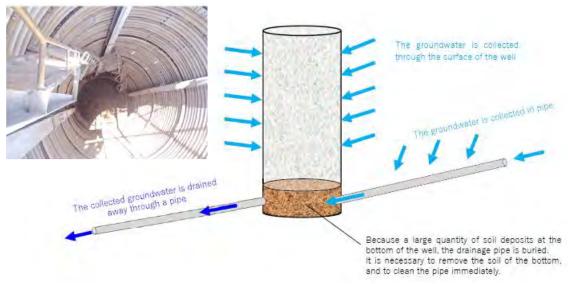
Existing drainage well in La Butte (Source: JET)
